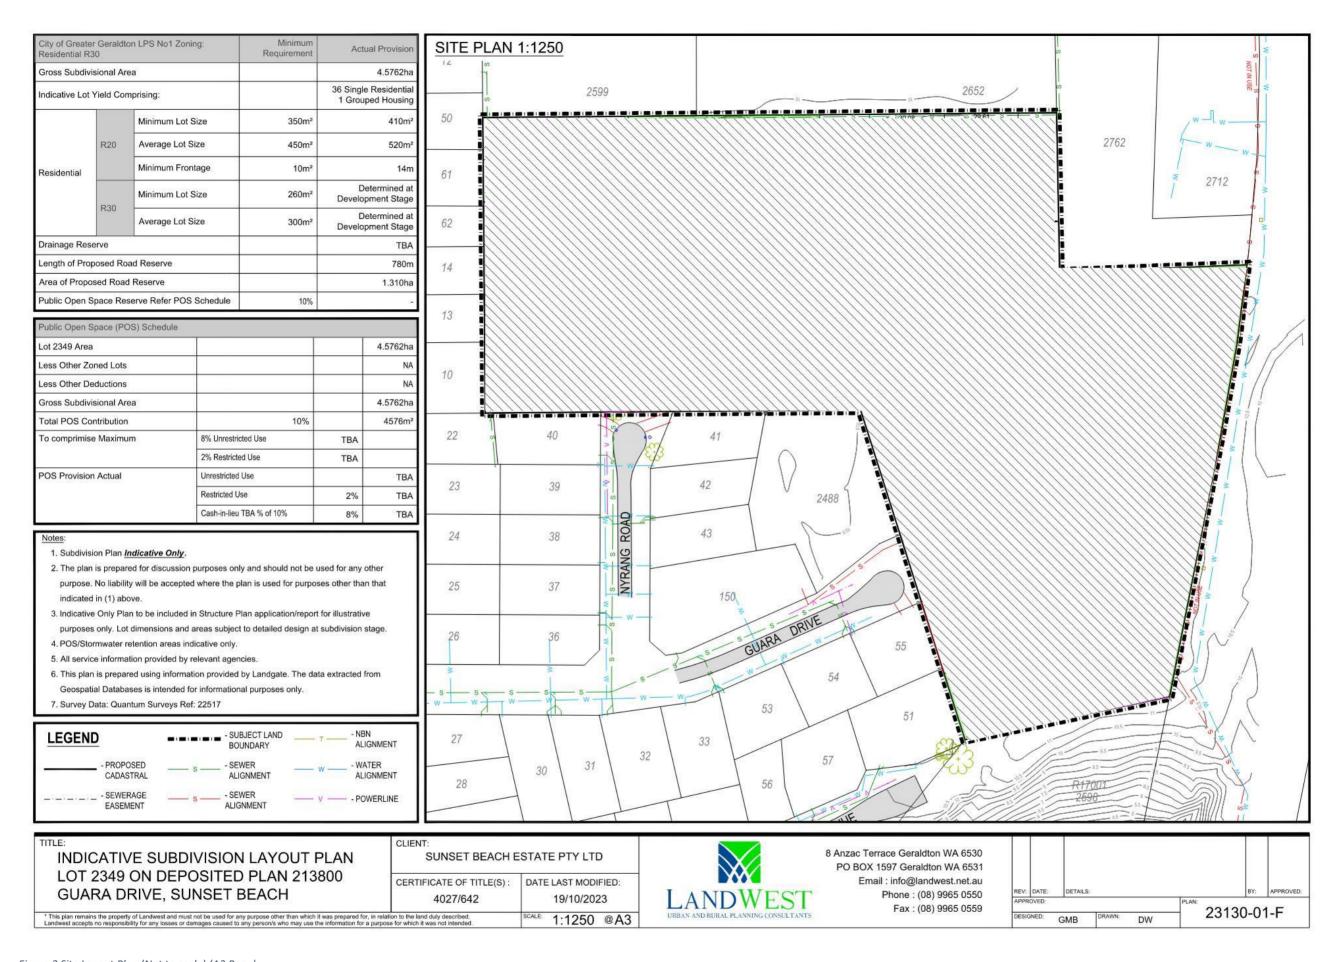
Site Layout Plan (Not to scale) (A3 Page)
